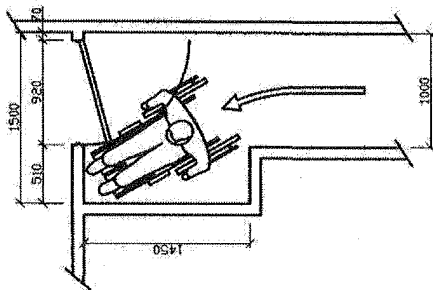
(a): Proposed Access to Doorway by Interfacing Corridor Width from AS1428 Part 1-2001 with Door Circulation Space from AS1428 Part 2-1992. This layout would not be accessible to many wheelchair users and would waste the additional space.
